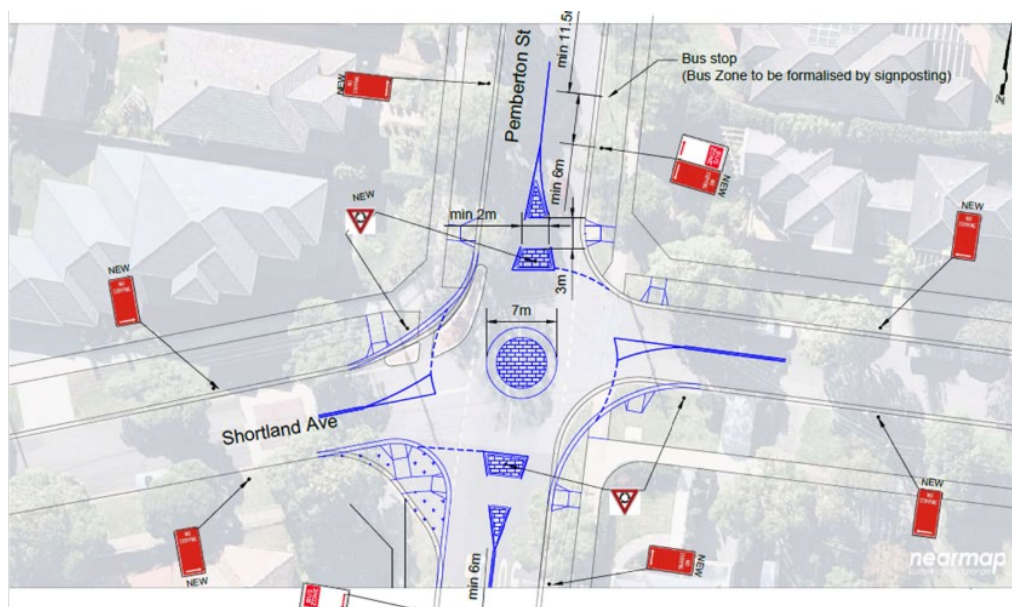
proposed roundabout at the intersection of Pemberton Street and Shortland Avenue
